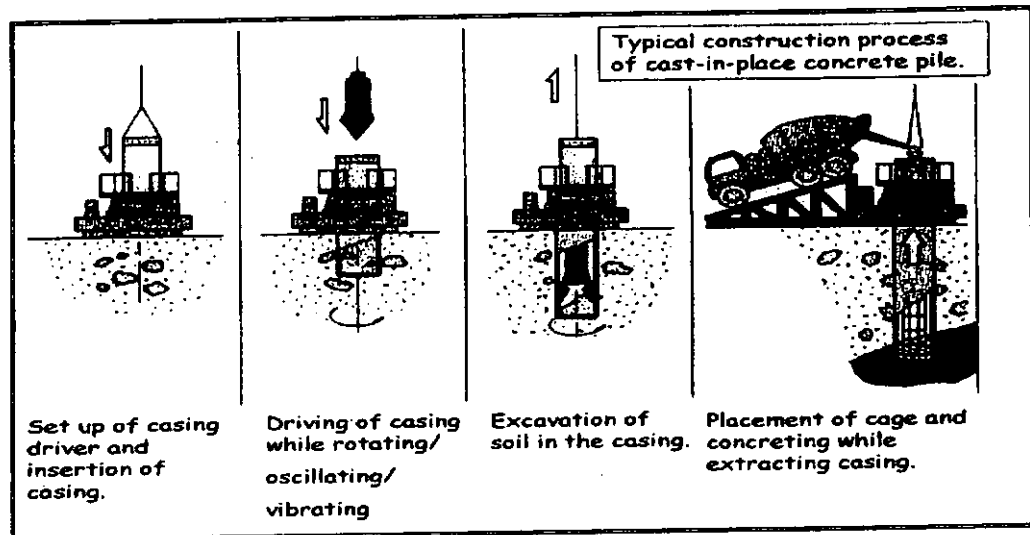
The typical construction process of a cast-in-place concrete pile
